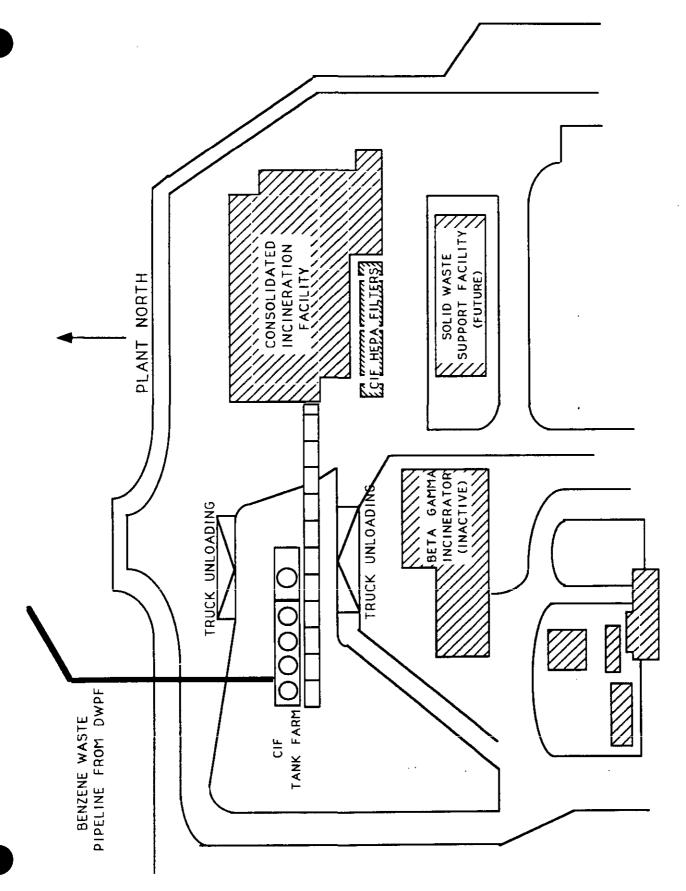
PROCESS BUILDING PLAN FOR CONSOLIDATED INCINERATION FACILITY
